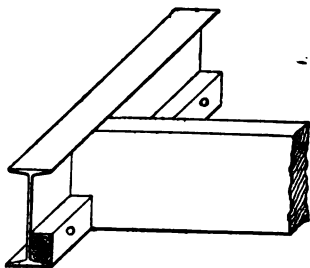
Wooden Beam Framed to I Beam with Wooden Cleat
